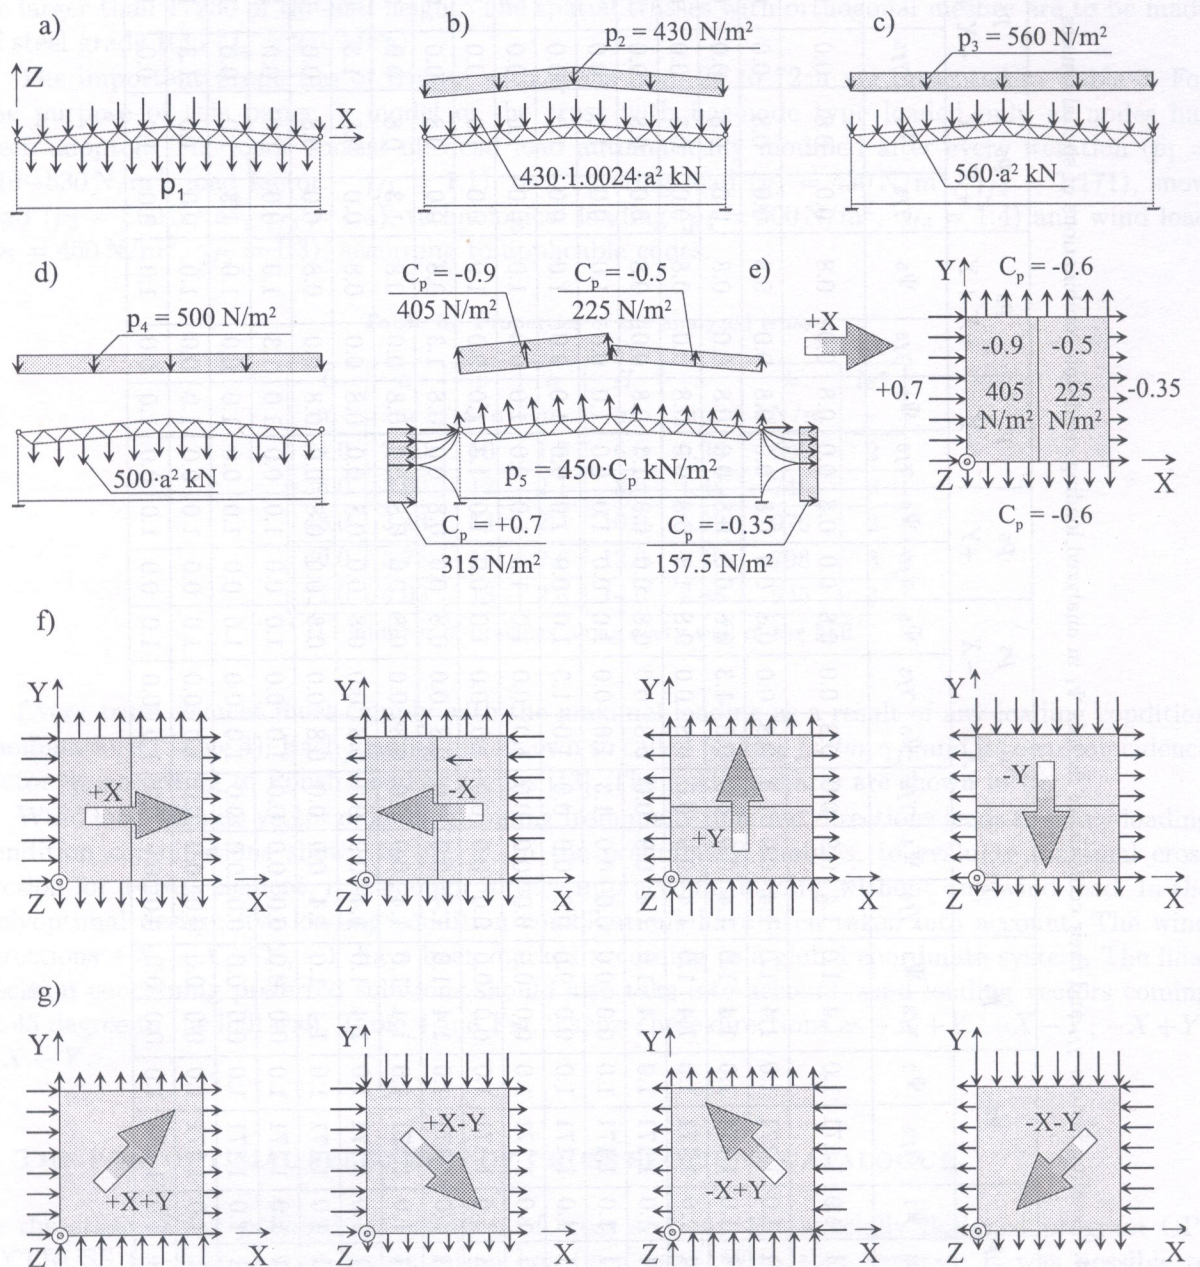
Load schemes of a spatial truss: a) dead load, b) roof covering load, c) snow load, d) technological loading, e) wind load, f) wind load with its vector vertical to the wall, g) wind load with its vector at 45 degree to the wall surface
